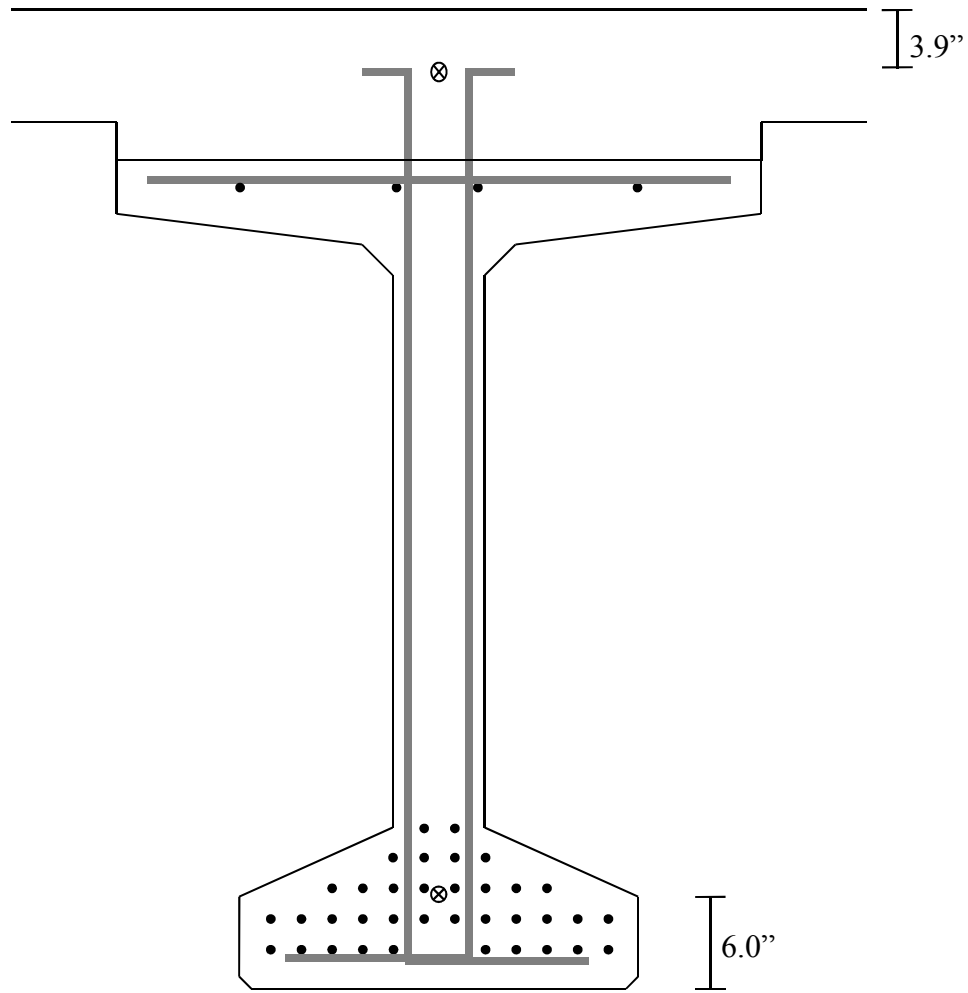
BT-54 Midspan Cross Section with a Bottom-Bulb and Deck VWSG
